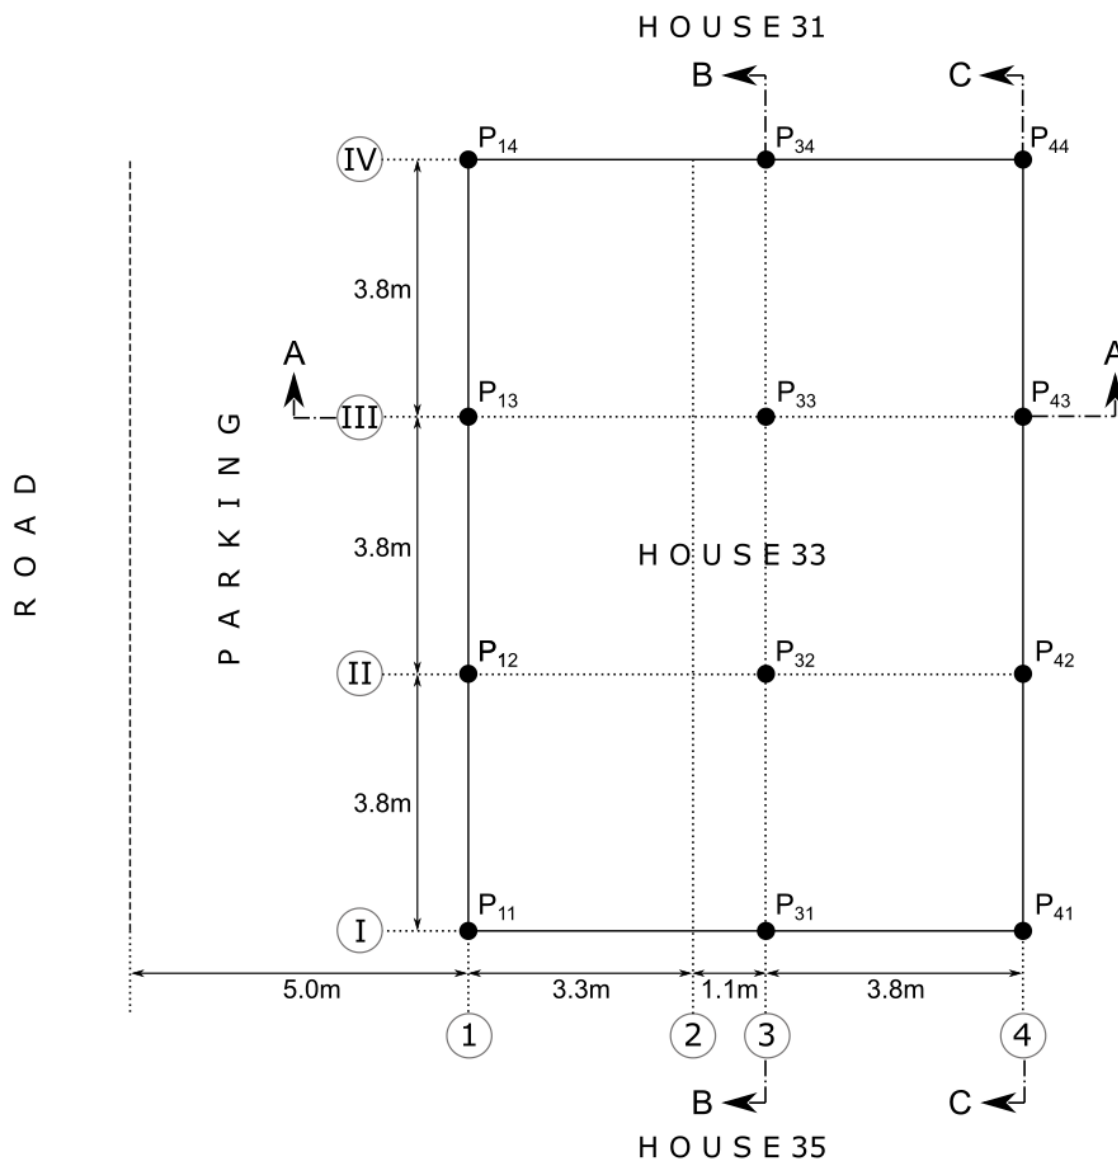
Plan view of house 33 showing the arrangement of the pile foundations.
